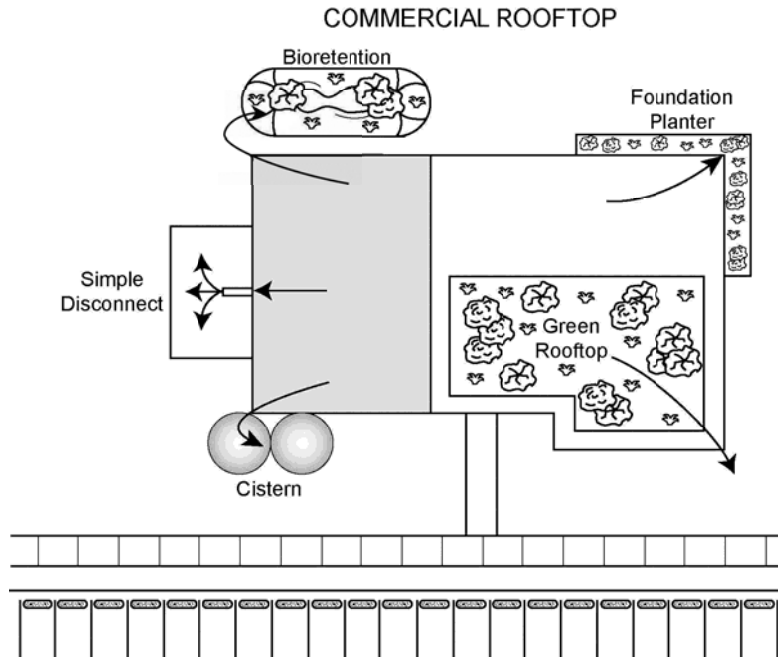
Roof Disconnection with Alternative Runoff Reduction Practices (Source: VADCR, 2011)
